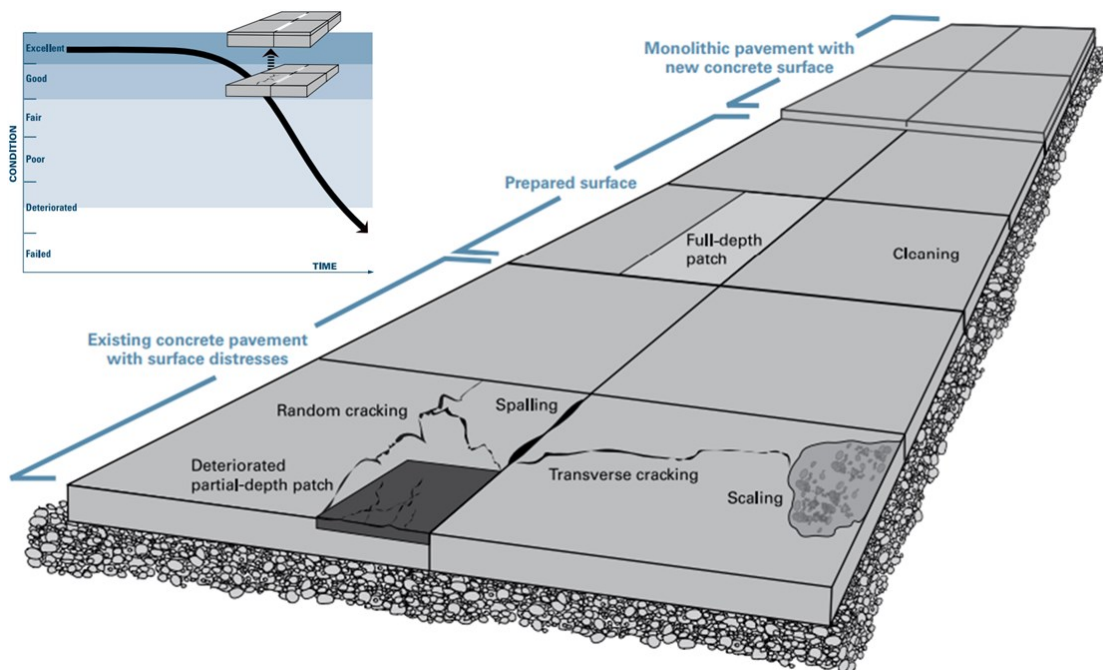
BCOC of good condition concrete pavement with surface distresses (Harrington et al. 2014)
